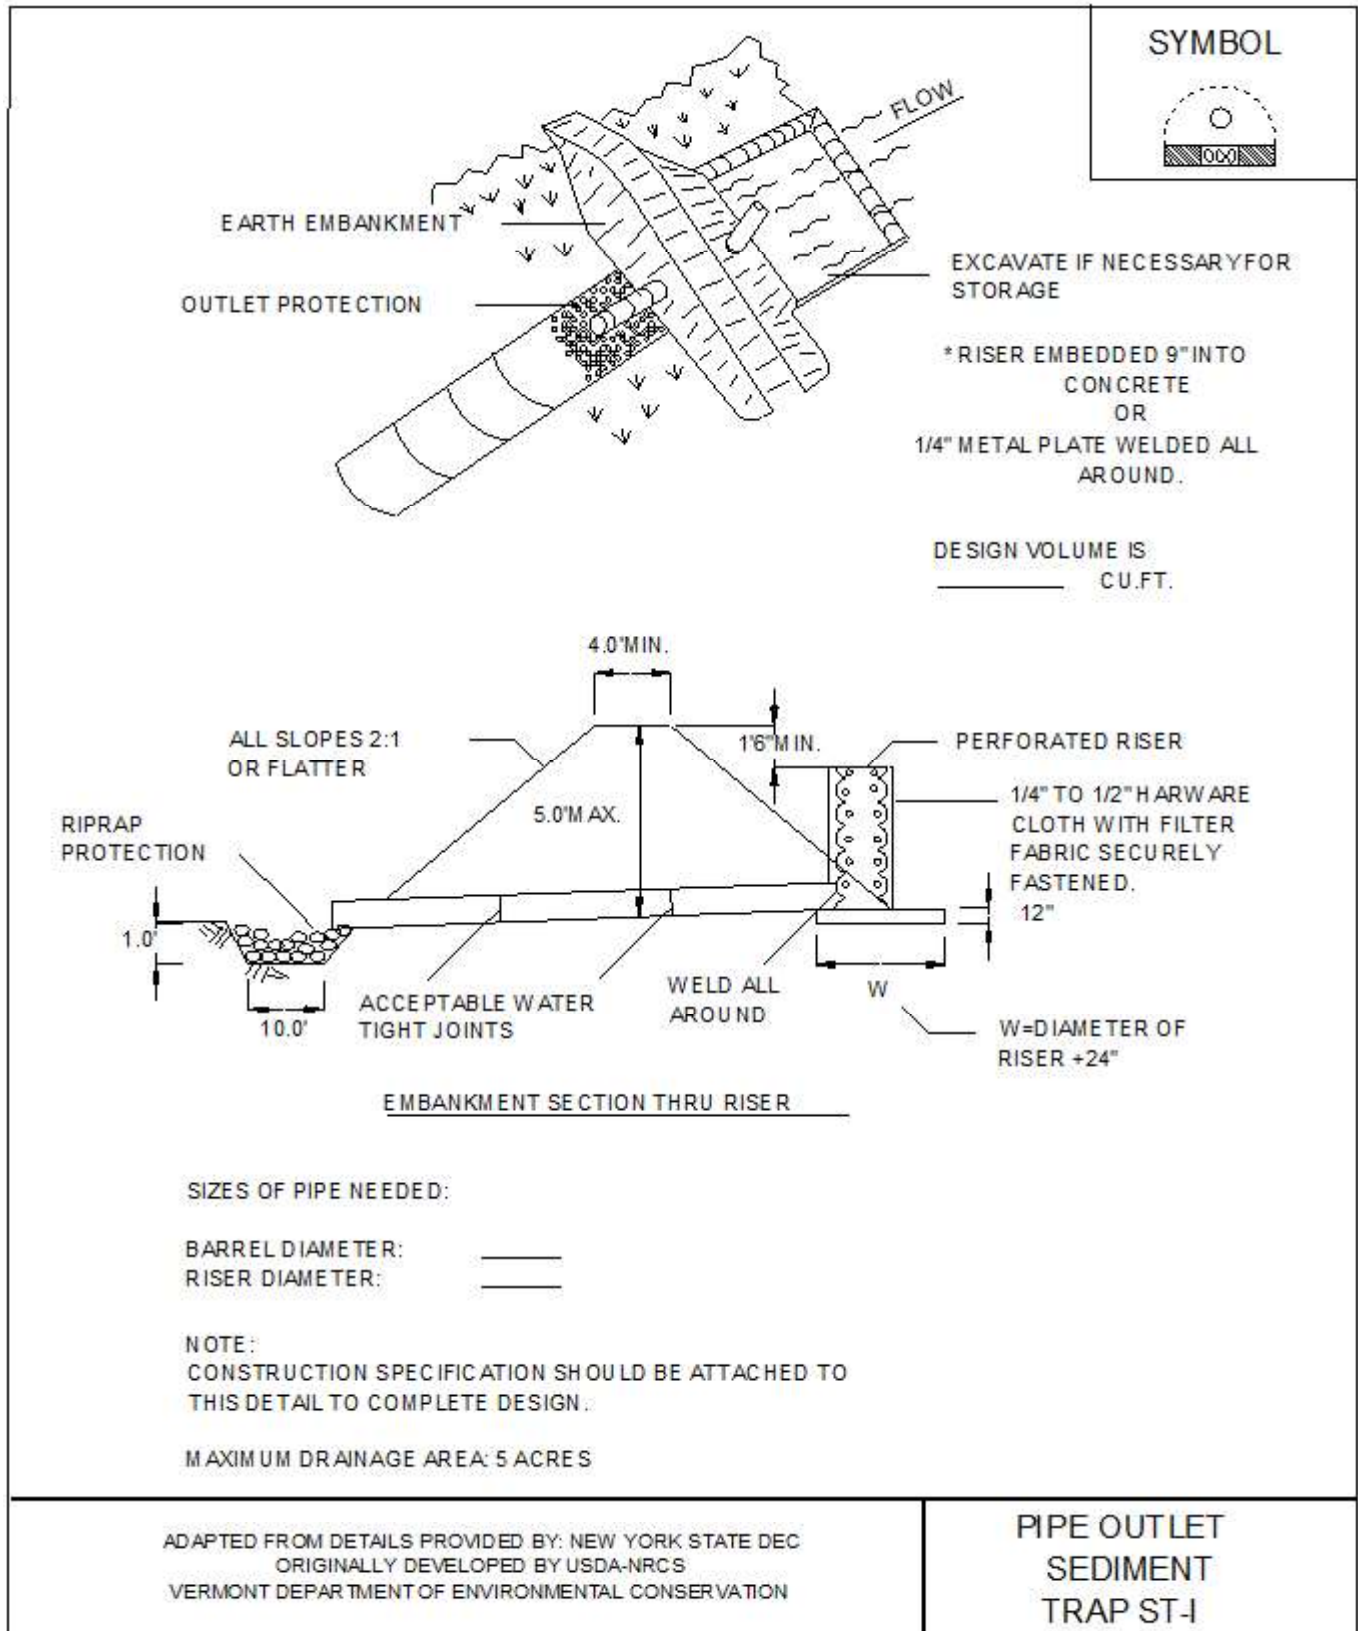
Pipe Outlet Sediment Trap ST-1
